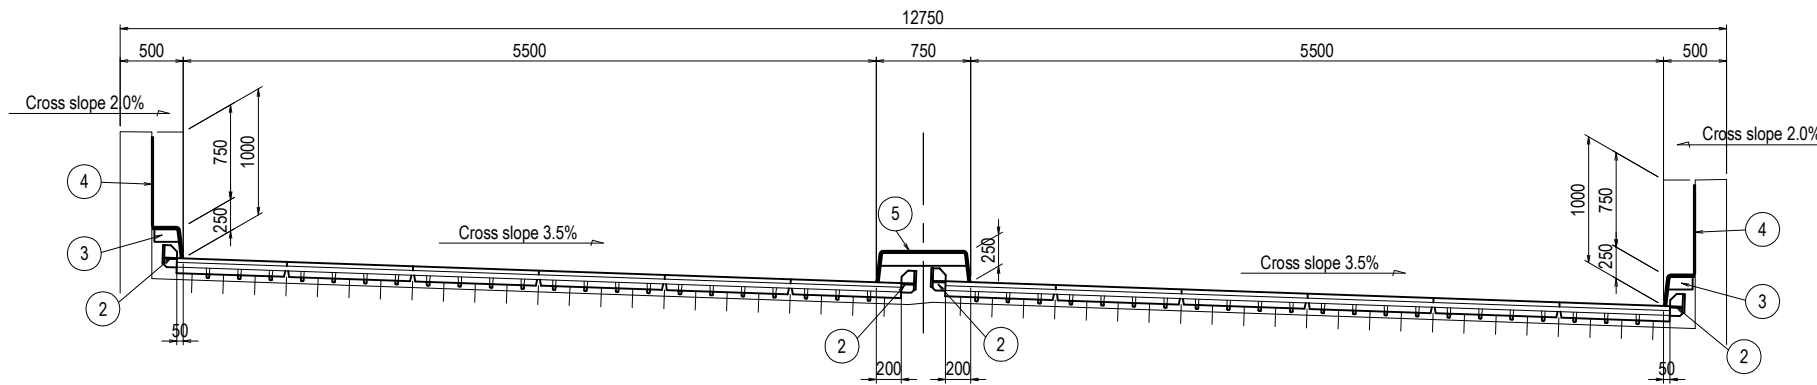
# DETAIL OF EXPANSION JOINT (AF1-PF2) (1)
